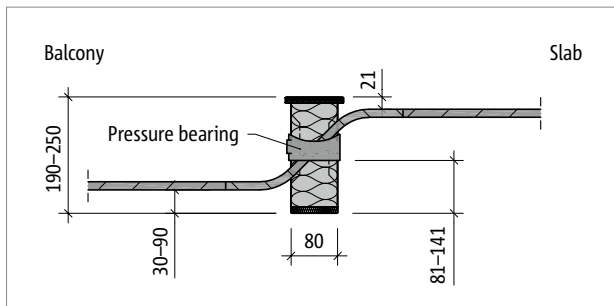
Schöck Isokorb® T type Q-E-V7: Product section
